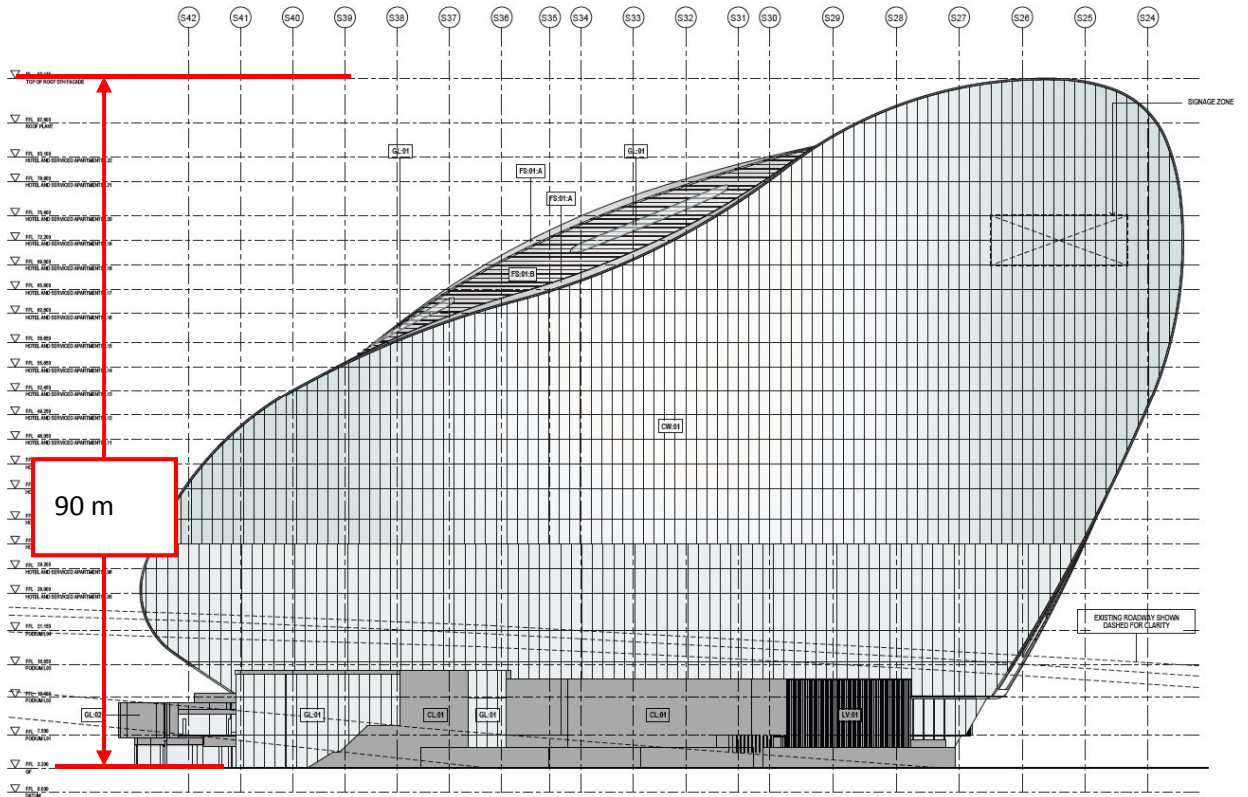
South Elevation of the proposed Development at 31 Wheat Road, Sydney
